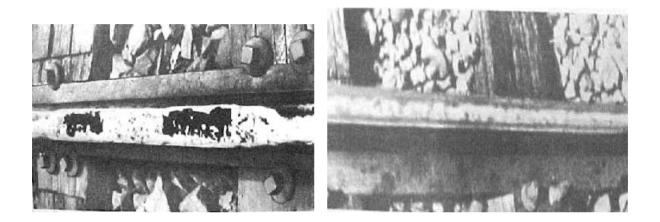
1221 OR 2221 - HEAD, SURFACE, BREAKING OUT RUNNING SURFACE (SCABBING)
